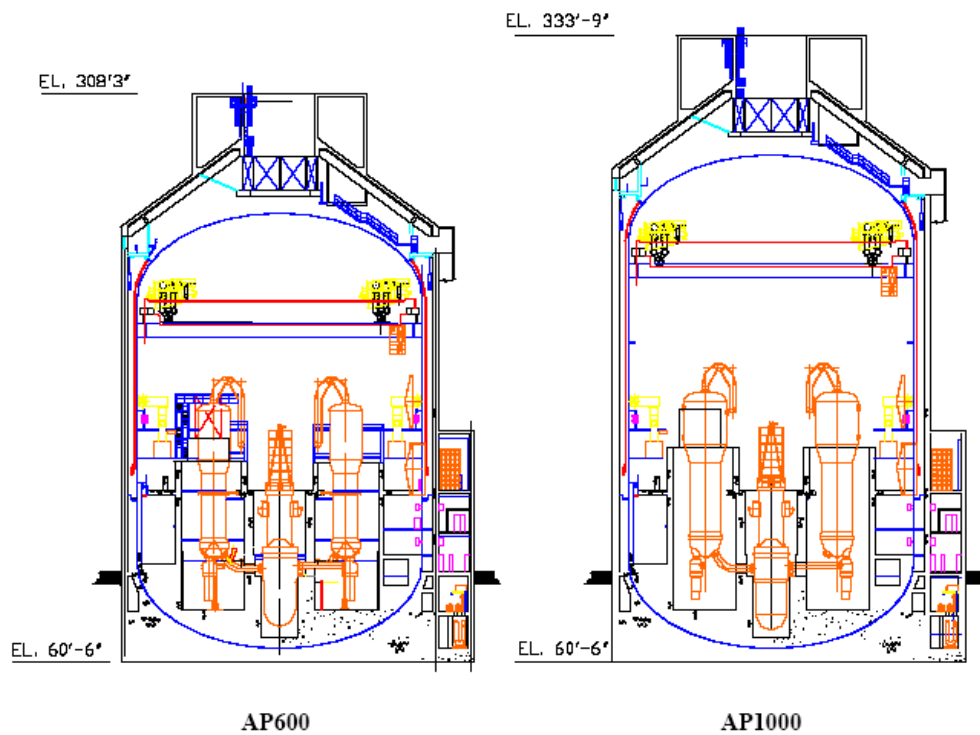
Westinghouse AP600 and AP1000 Plants (Section)
